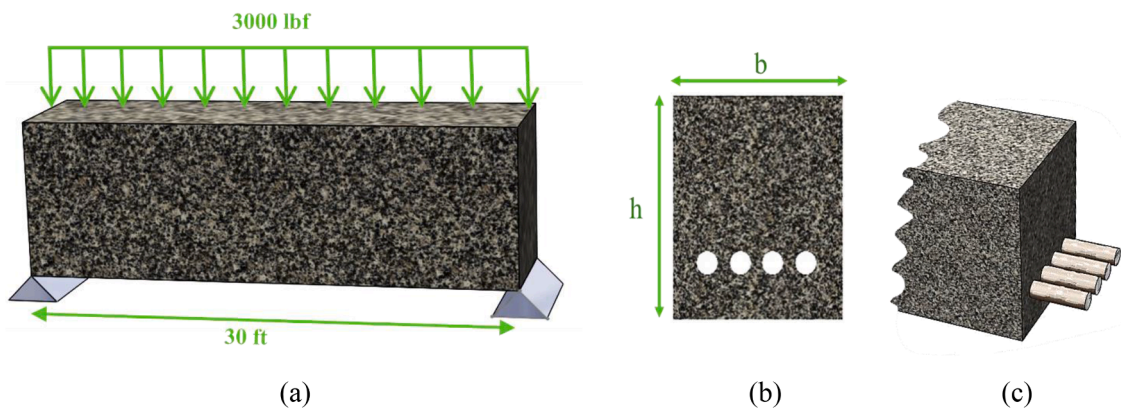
Reinforced concrete beam system (a) loading condition, (b) section view (c) reinforcing details.
